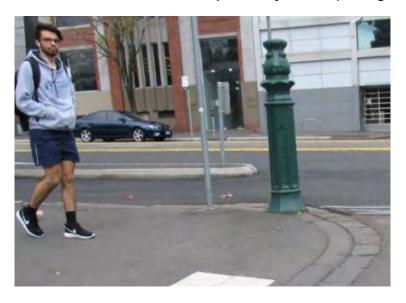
Swanston Street Carlton – Five row wide pitcher channel in side street intersection reduced to a single row to accommodate access ramps
